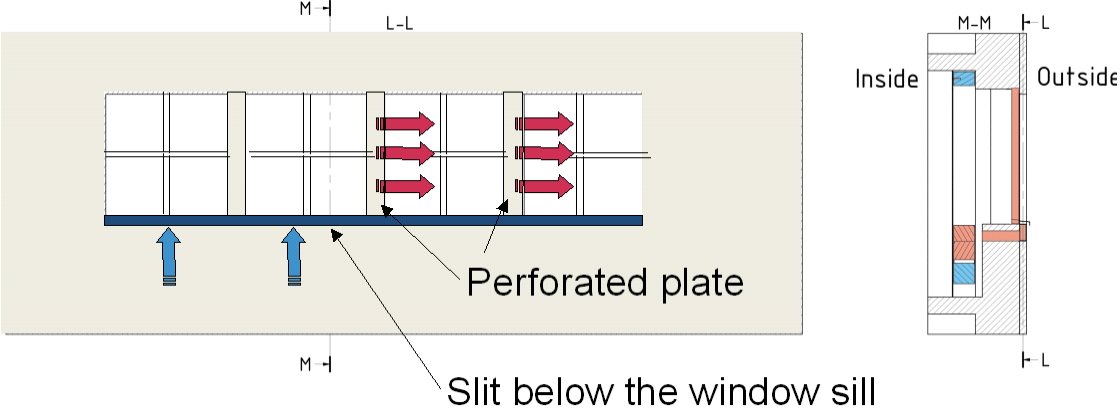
View from outside: Ambient air intake via slit below the window sill, exhaust air outlet via perforated plate at the window post.
